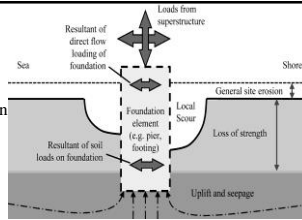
Schematic of tsunami loading condition for a foundation element
